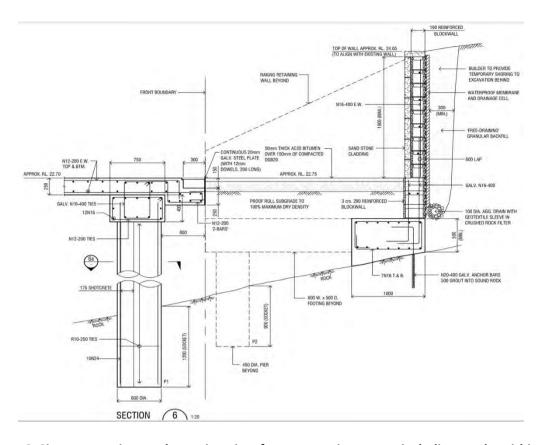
Site preparation works section view for construction access including works within the adjoining public road reserve
